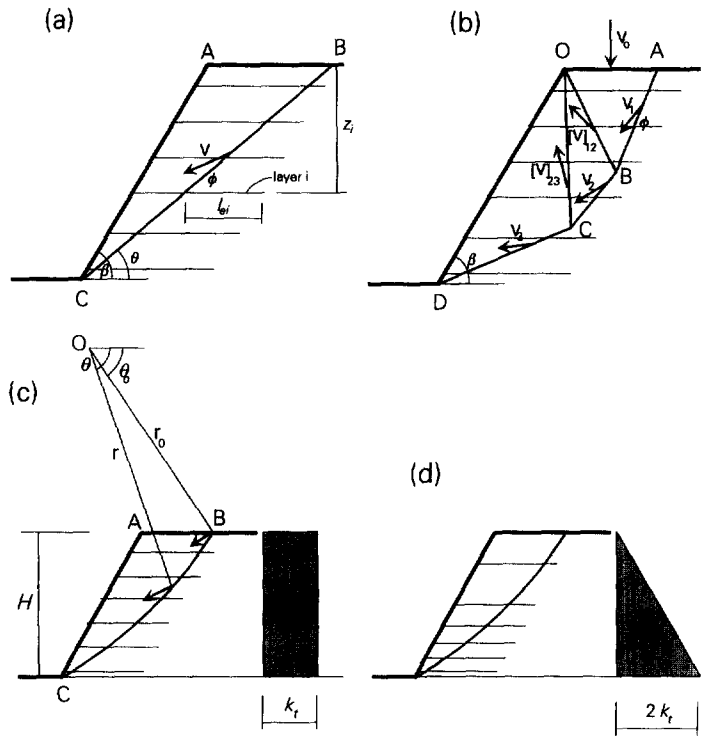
Admissible slope failure mechanisms: (a) single-block mechanism, (b) multi-block pattern, (c) rotational collapse – uniform reinforcement, and (d) varied spacing of reinforcement.
